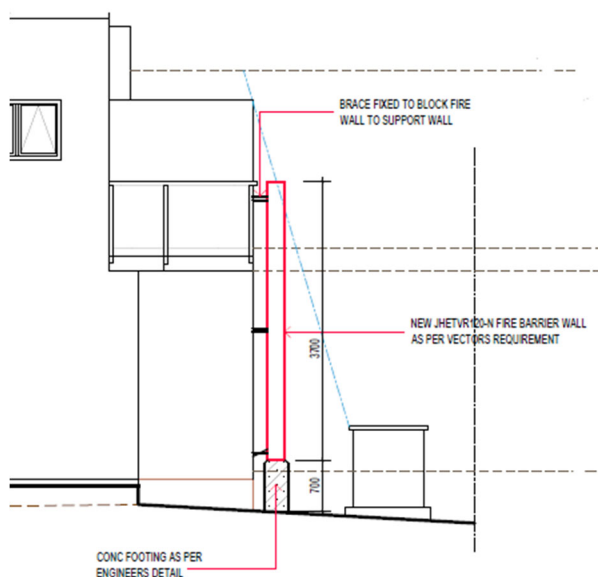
Elevation showing the proposed fire wall attached to wing walls
